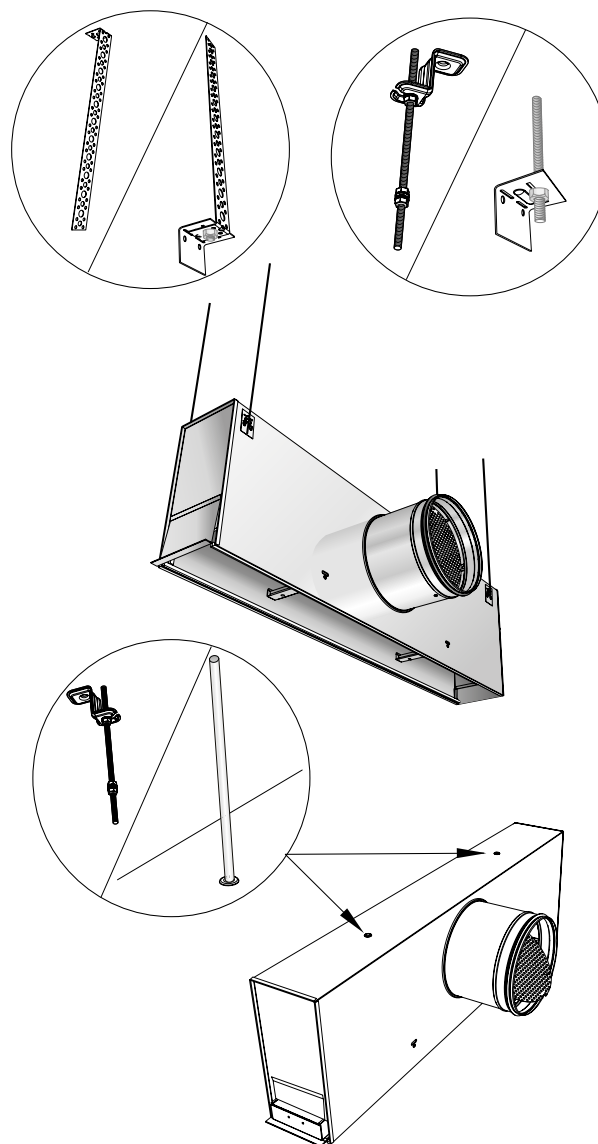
Alternative installation with threaded rod, mounting strips or wire.
